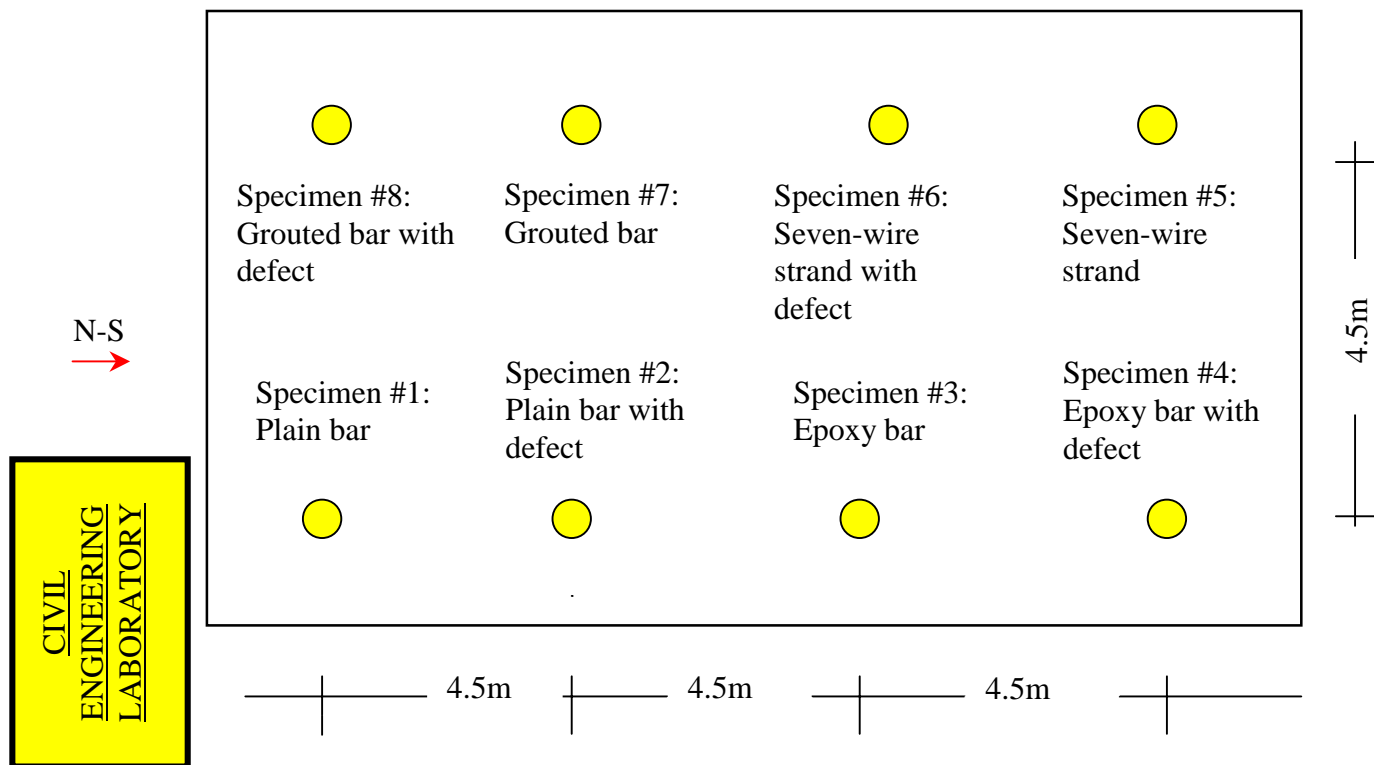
Plan View of In-Situ Specimens at U.B. Test Facility.
